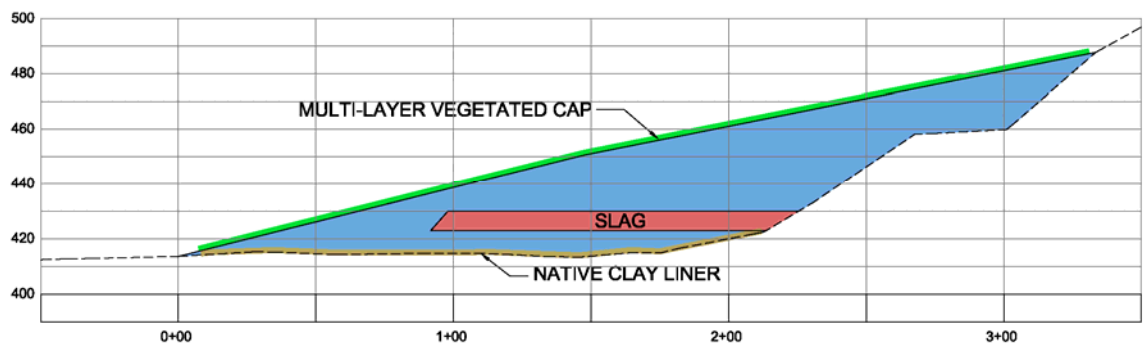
Cross Section through Pit Repository. Note encapsulation of smelter slag.
